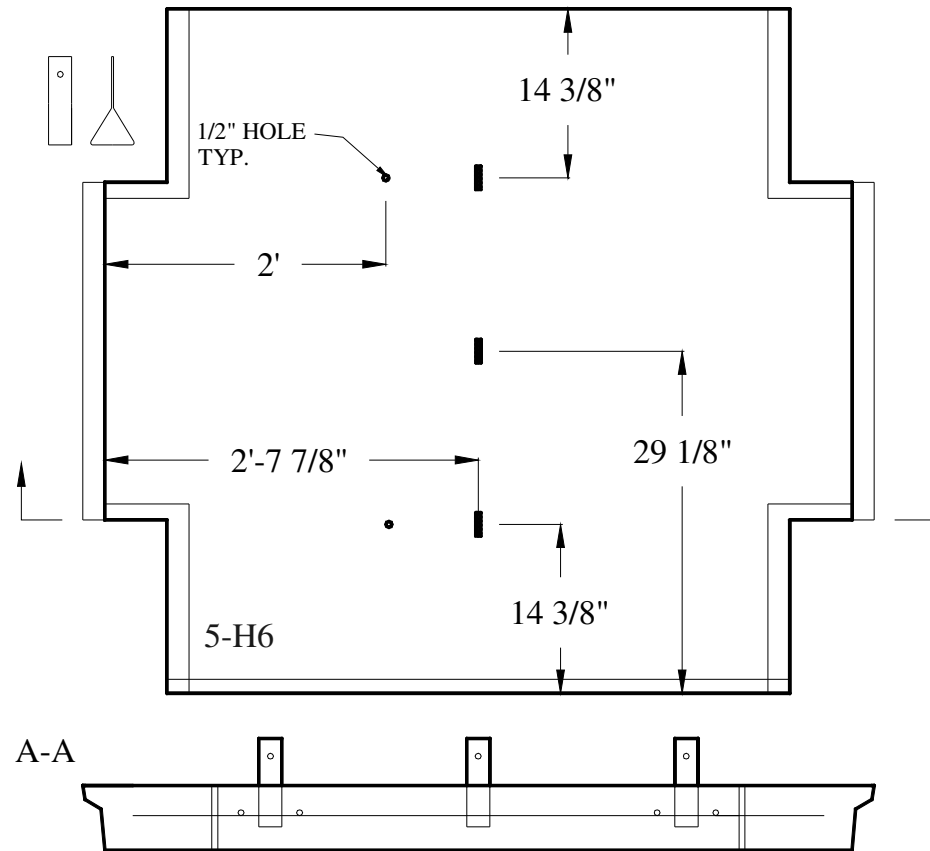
Location of Concrete Strain Gages on Wall Panel
